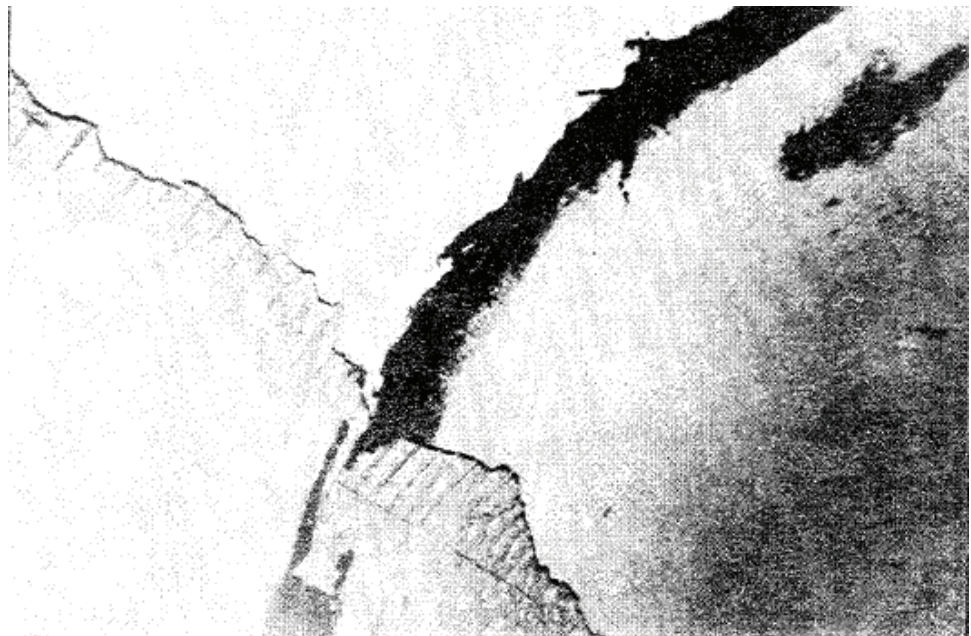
(Exhibit 112) Spalling Exposing Reinforcing Steel
